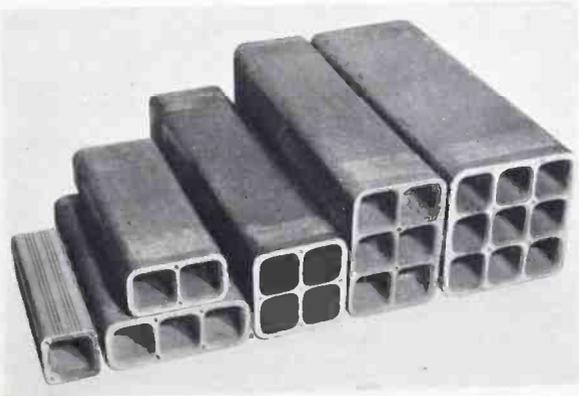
Types of vitrified clay conduit used in the telephone plant
